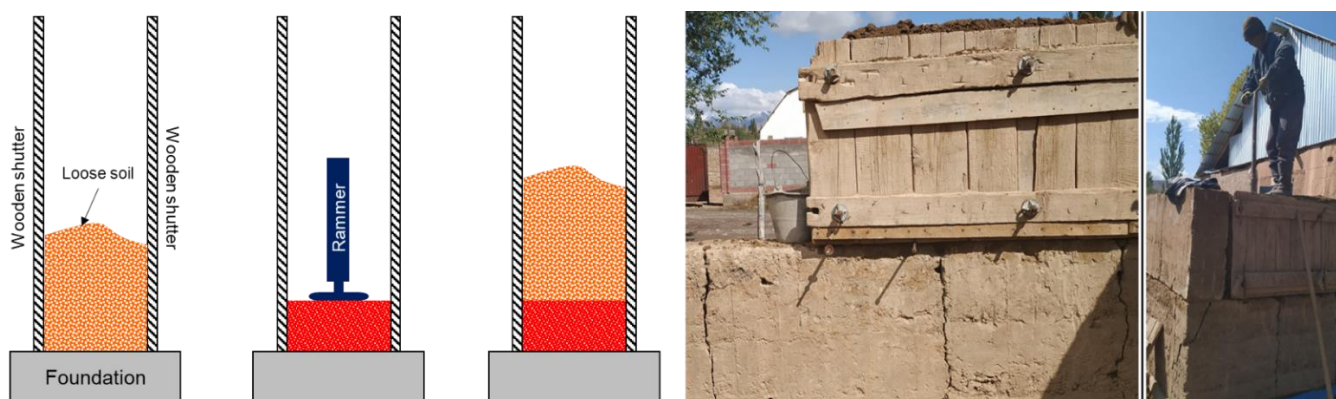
Rammed earth construction principles (left) and practice in rural Kyrgyzstan (right).
